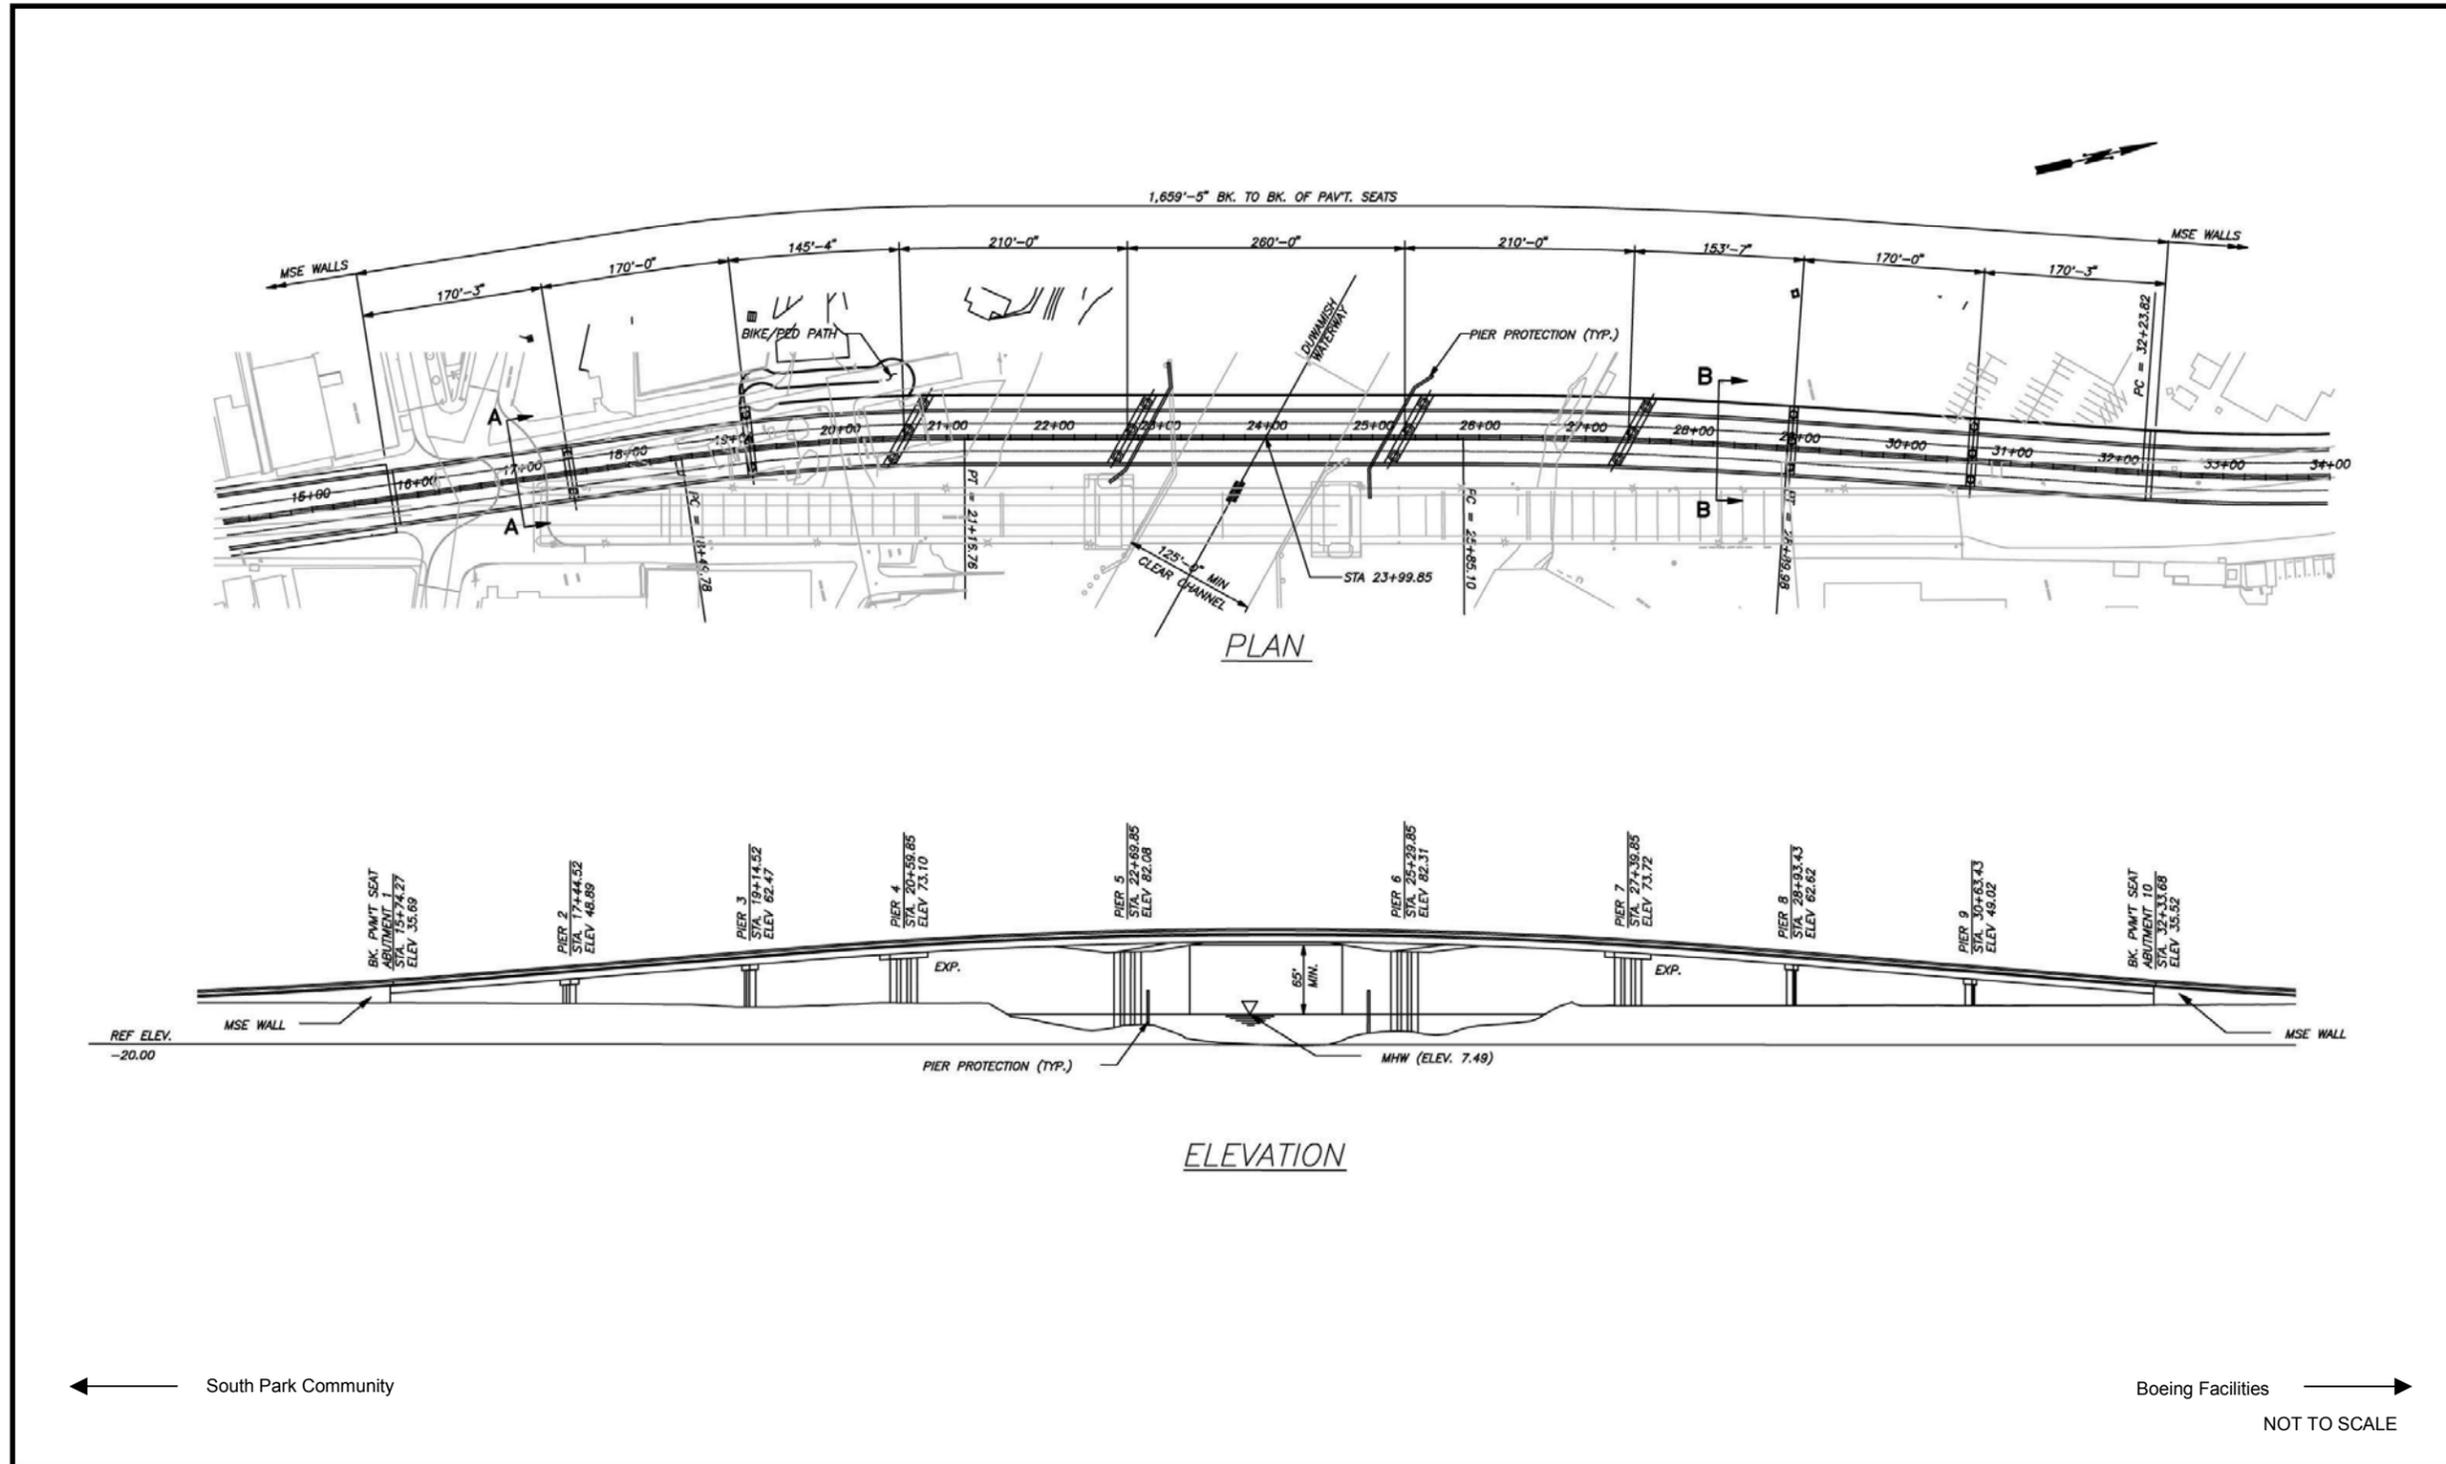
Mid-Level Fixed-Span Bridge Alternative
